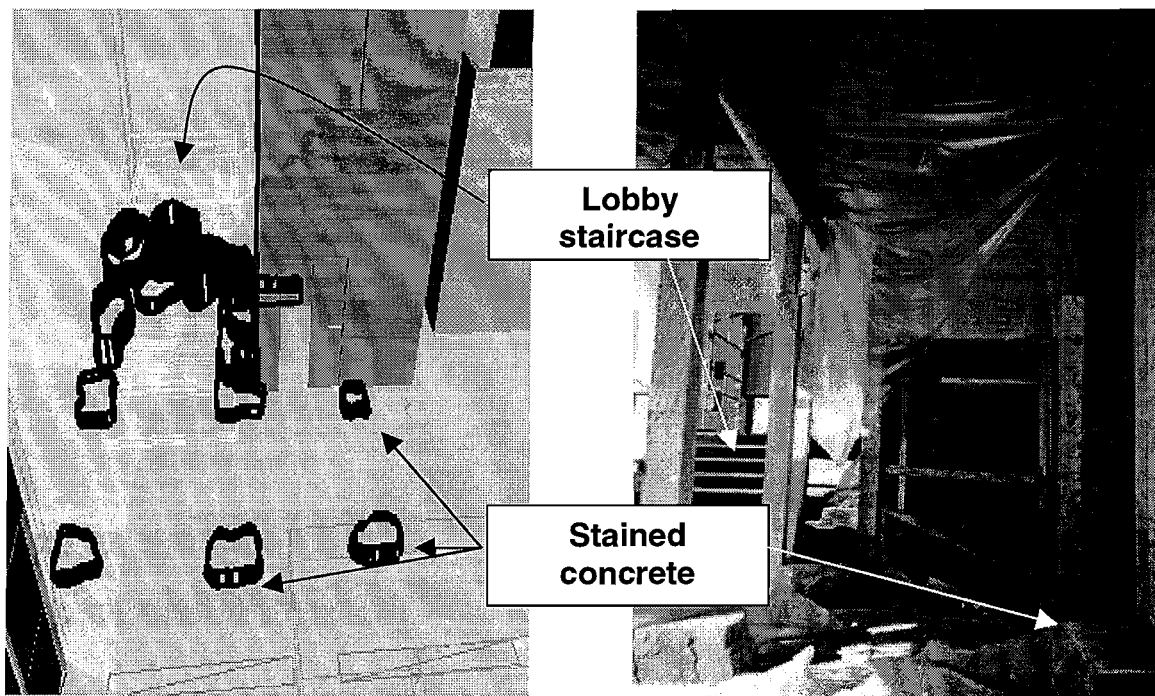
4D model and picture showing possible accessibility problems due to early installation of stained concrete
